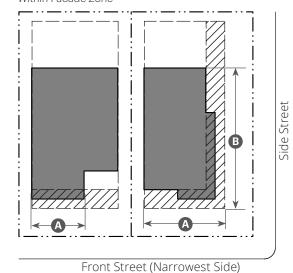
B Applying the Required amount to the Facade Zone
